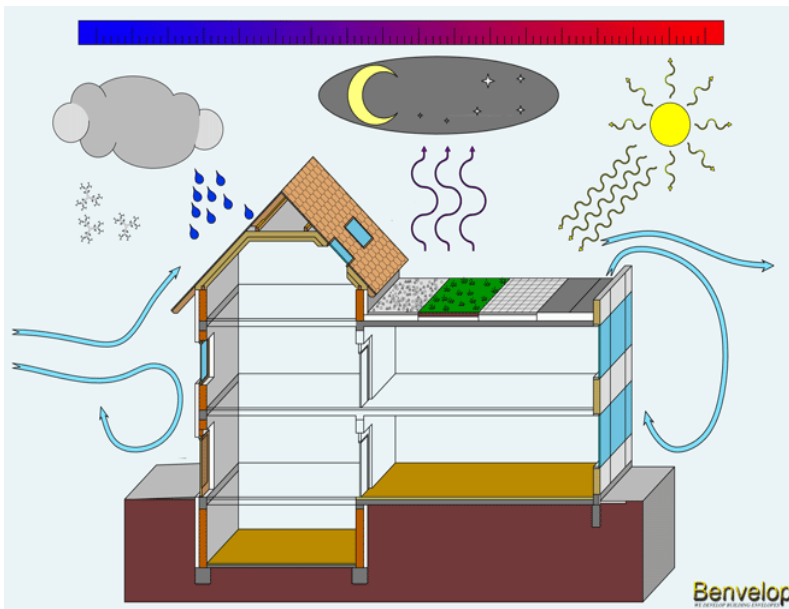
Schematic of building Envelope. Source: <http://www.benvelop.com>.
